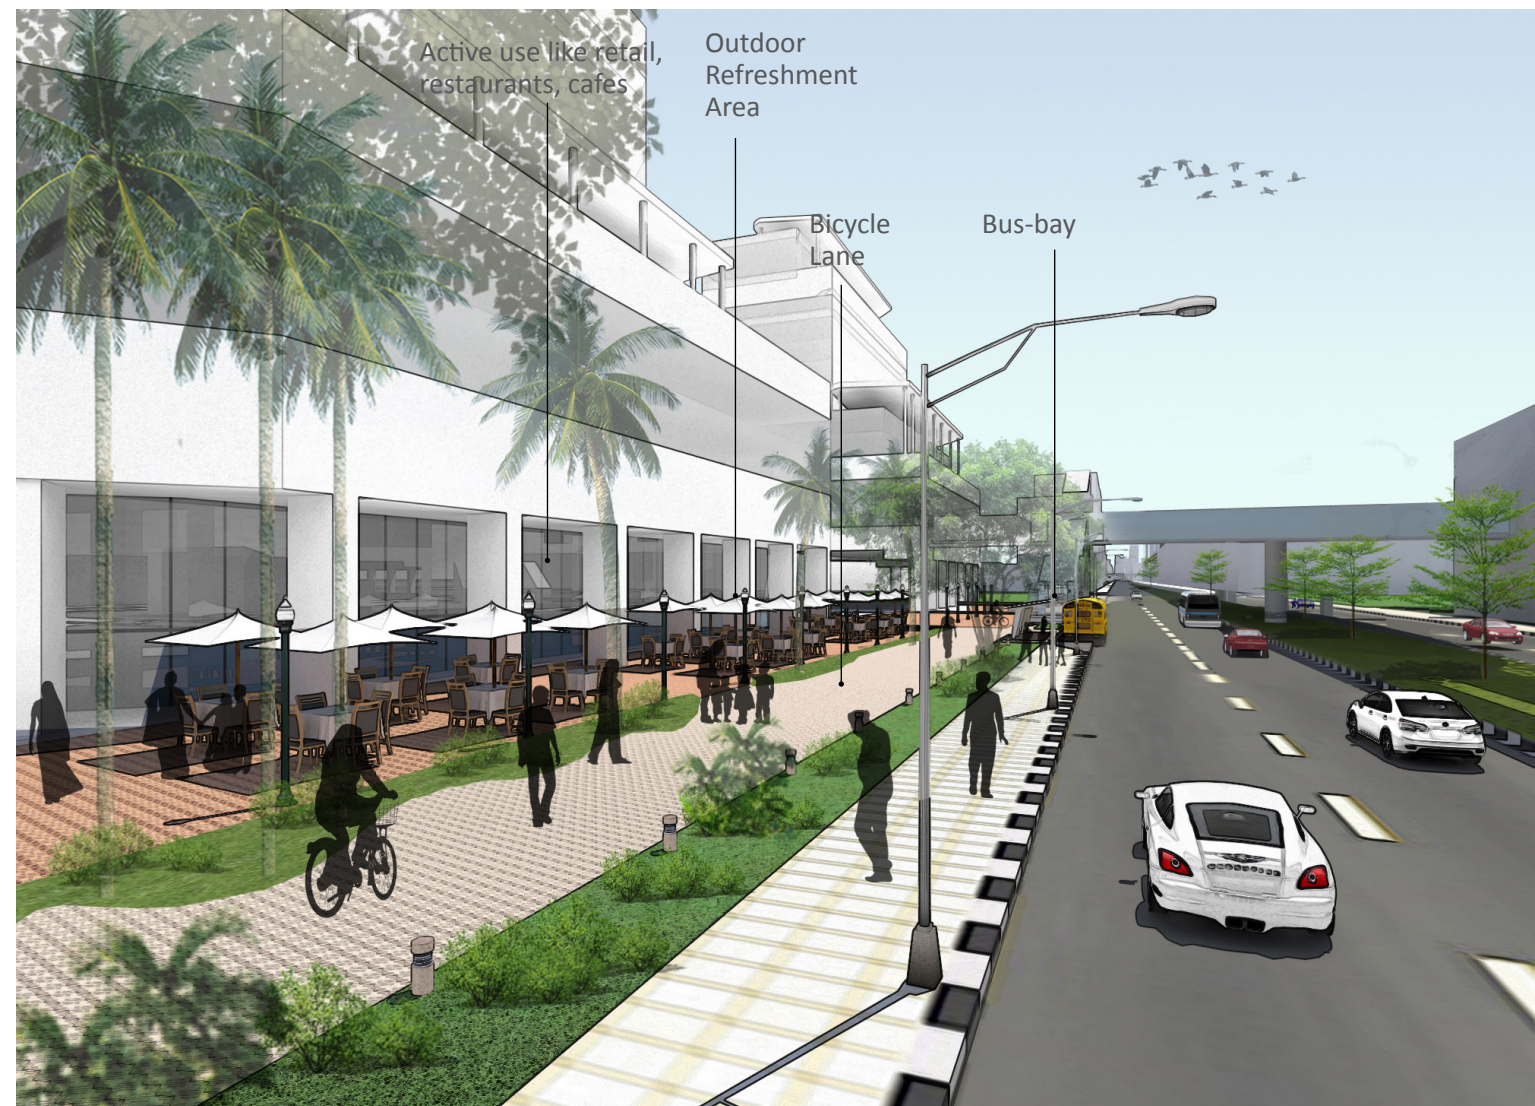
Artist's Impression - Amaravati Downtown Road
